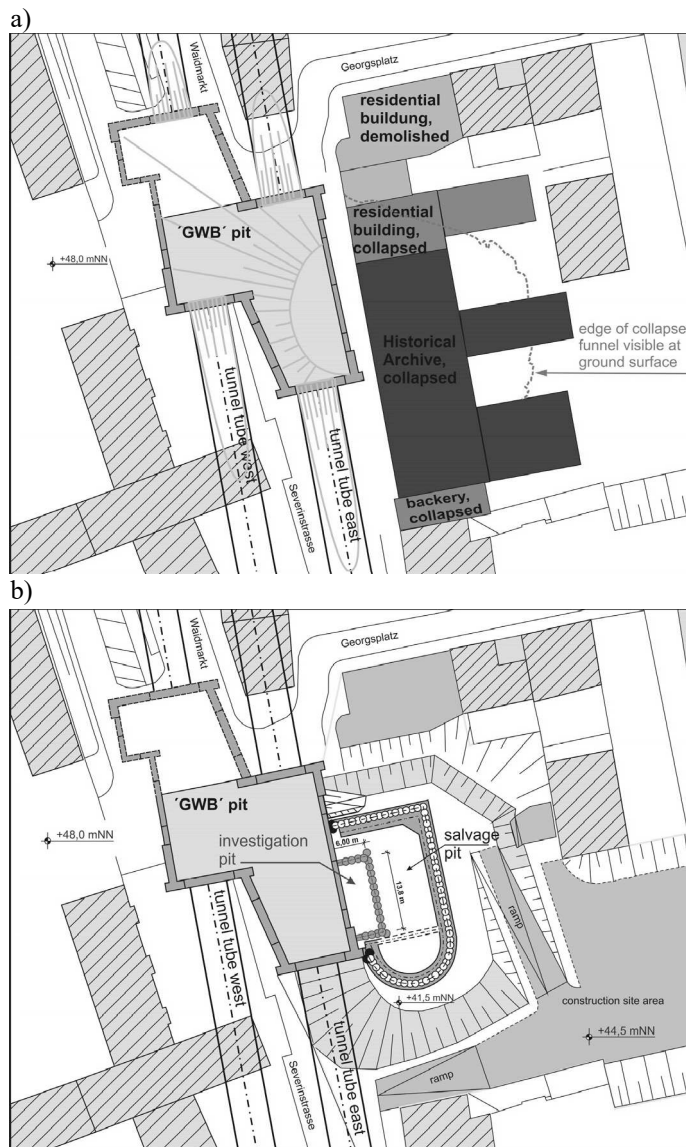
Site plan of the deep excavation 'GWB' at 'Waidmarkt' square in Cologne, a) at the time of the collapse with existing buildings and upper edge of the failure funnel, b) with salvage pit and investigation pit after the accident during salvage and preservation of evidence.
